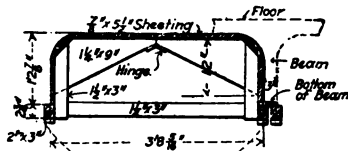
Slab and Girder Floor Mold, Kelly & Jones Factory.
